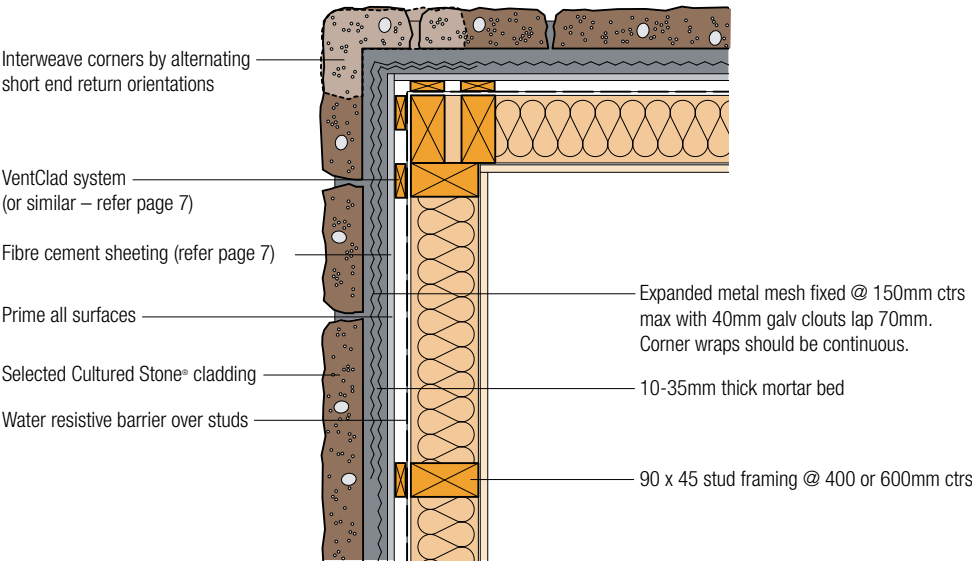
Fibre Cement Clad Typical External Corner - Plan (Dwg # CS-02.01)
